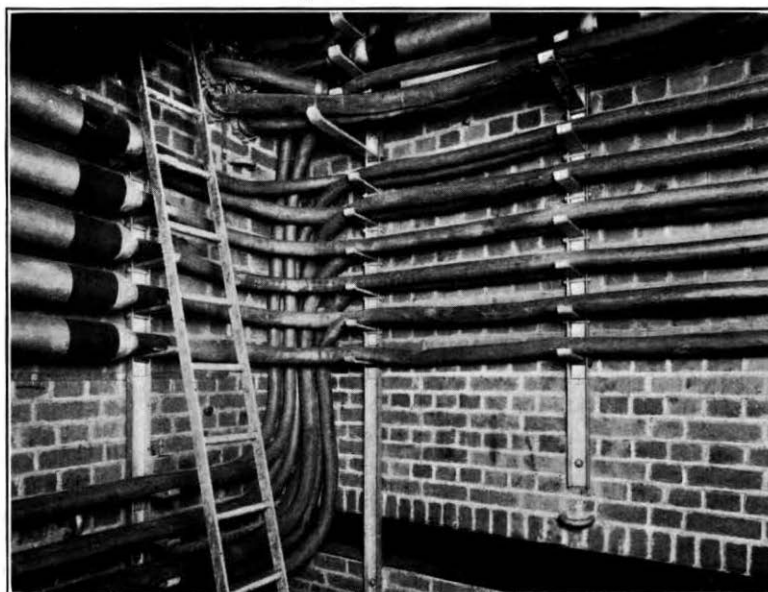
WEST WALL, LONDON WALL MANHOLE.
